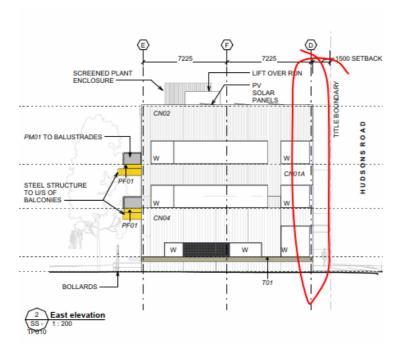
East elevation (shows unprotected façade exposed to northerly aspect), Source: North East Plot Proposed Elevations and Materials TP110 Rev A by *Six Degrees Pty Ltd
